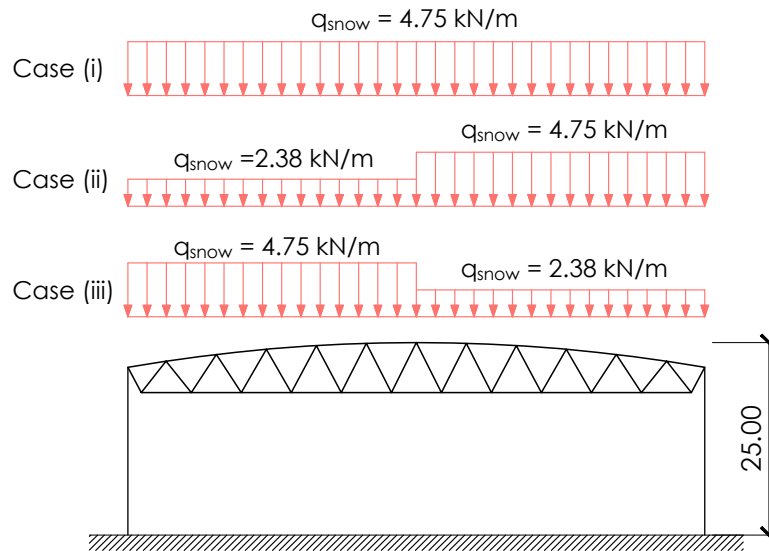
Snow load distribution on a internal truss for undrifted and drifted load arrangement.
